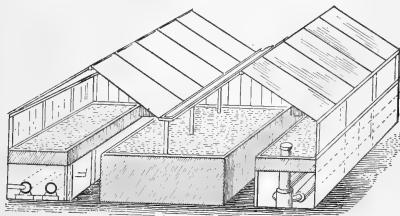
CROSS-SECTION OF PORTABLE GREENHOUSE.
